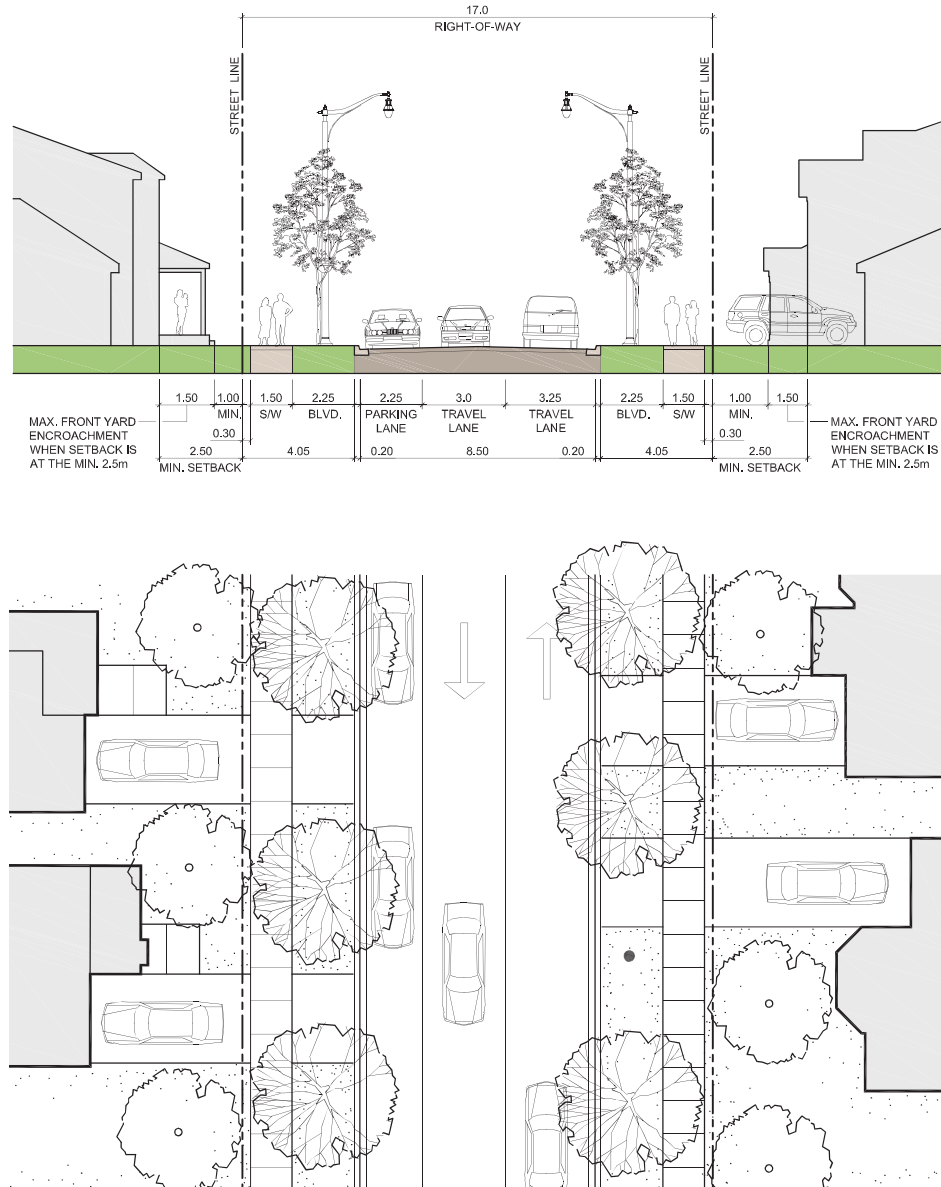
Low Density Residential / Local Road Streetscape - 17.0m R.O.W. / 2 travel lanes / on-street parking on one side / 4.05m boulevard.
